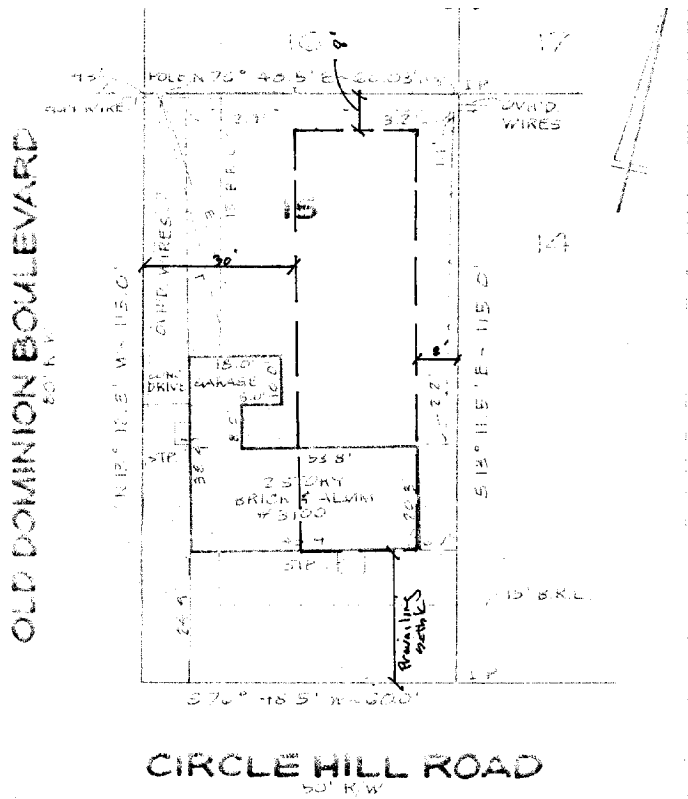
shows how an addition could be configured at the rear of the existing house. Such an addition could meet zoning requirements without the need for a variance. Alternatively, if the addition were to be constructed in line with the existing house's east wall, the owner could apply for a special exception.
